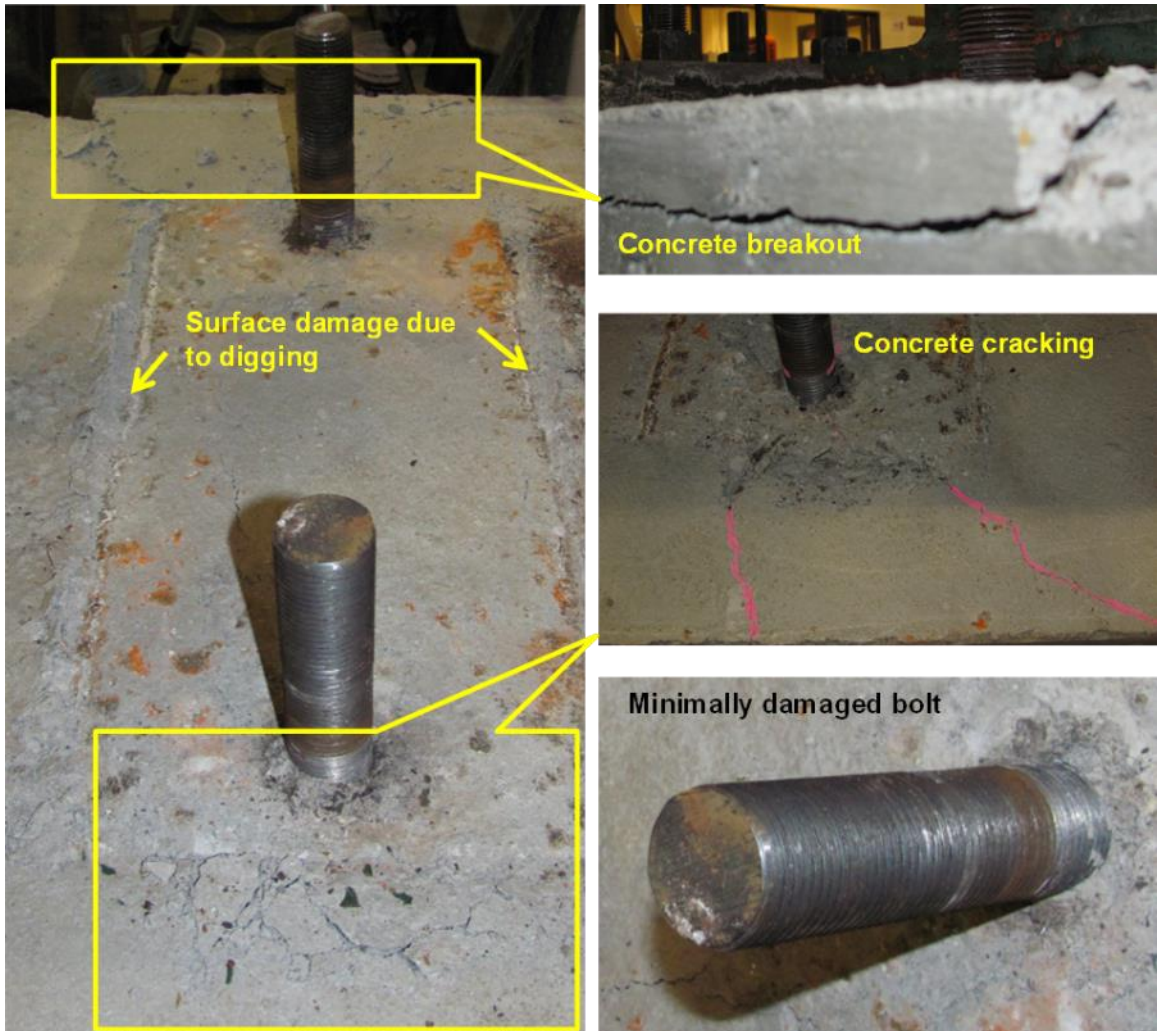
Photographs of the reinforced concrete pedestal taken after the cyclic test showing concrete cracking and bolt damage
